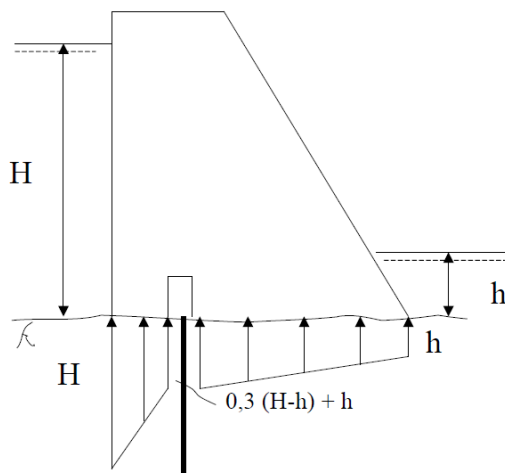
Uplift pressure in rock joints with drainage gallery installed inside the foundation (RIDAS, 2020)
